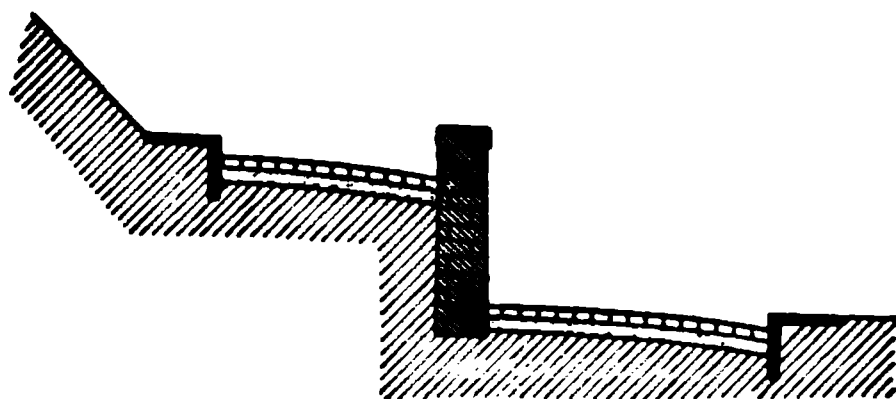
CROSS SECTION OF SIDE-HILL STREET.
